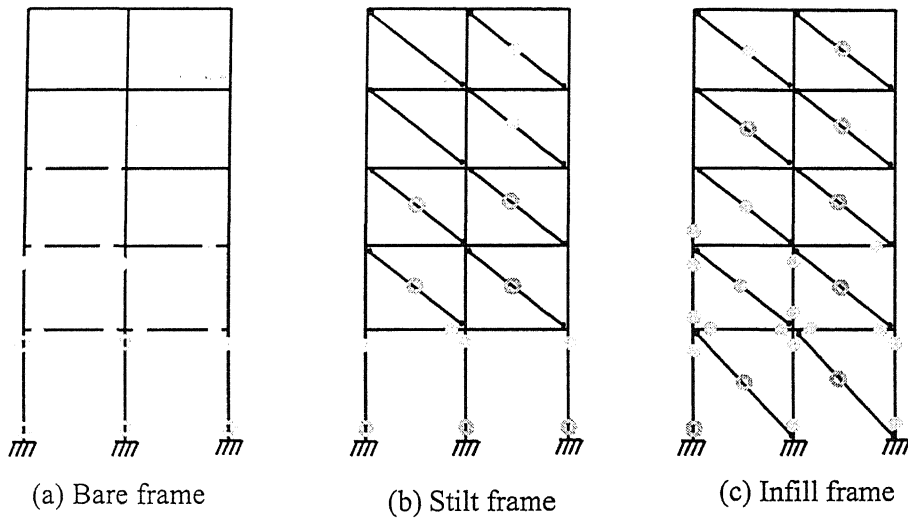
Location of hinges at failure in frame-B of design case EQ5
